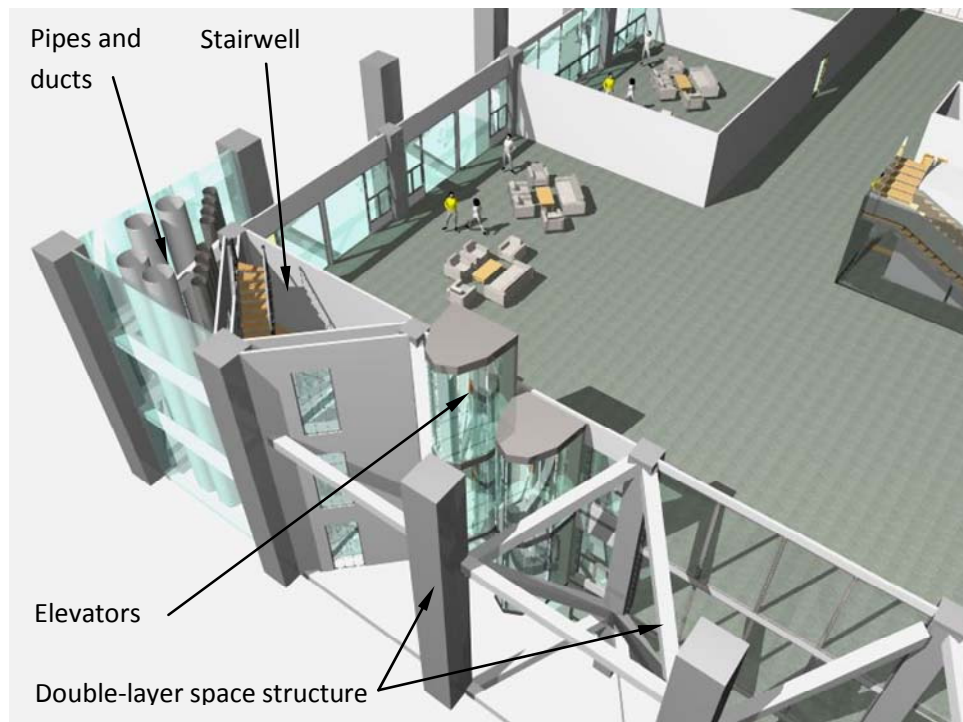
Elevators, stairs, pipes and ducts are located in the space between the external and internal layers of the vertical space structure
